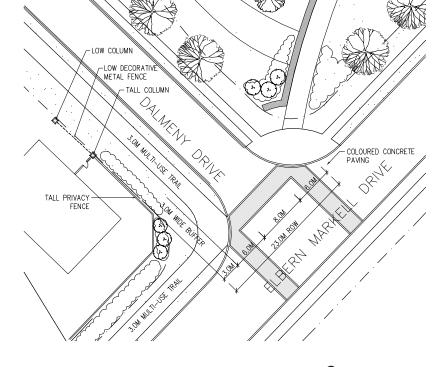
Concept Plan of Executive Gateway Feature C
